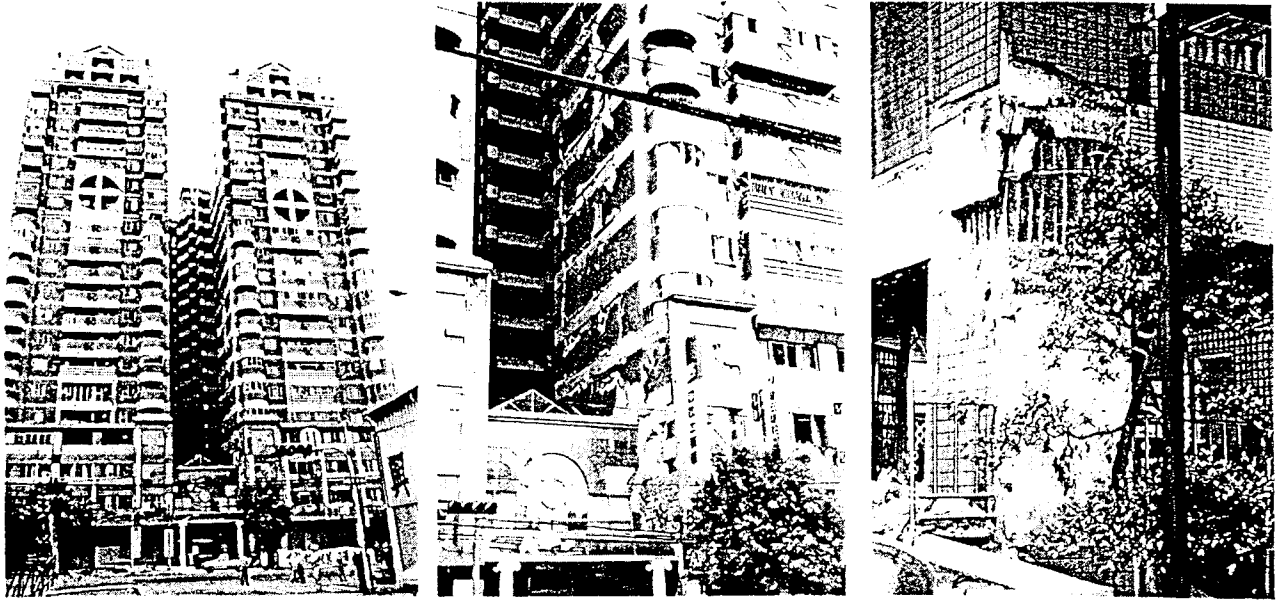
Damage of high-rise multiple building (Fengyuan City, Taichung County)
